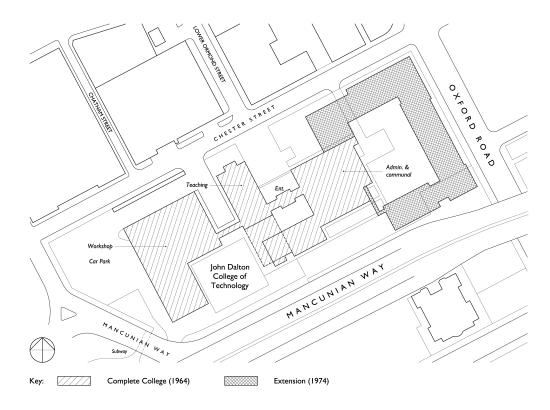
John Dalton College of Technology (initially Central College of Technology): site plan of complete college [Source: Author's own image.]
